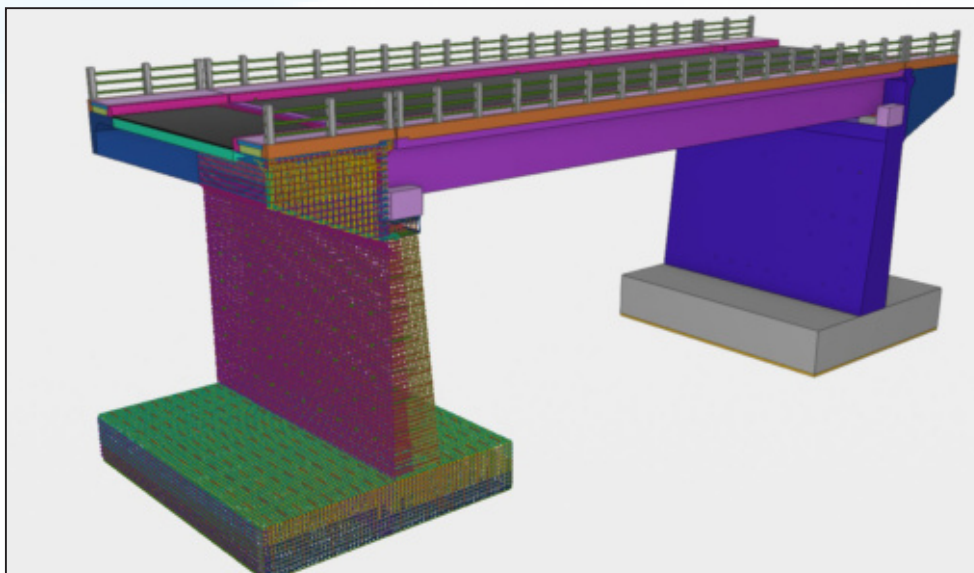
The Bridge Information Modelling (BrIM) view showcasing reinforcement details of the wing wall and Abutment
